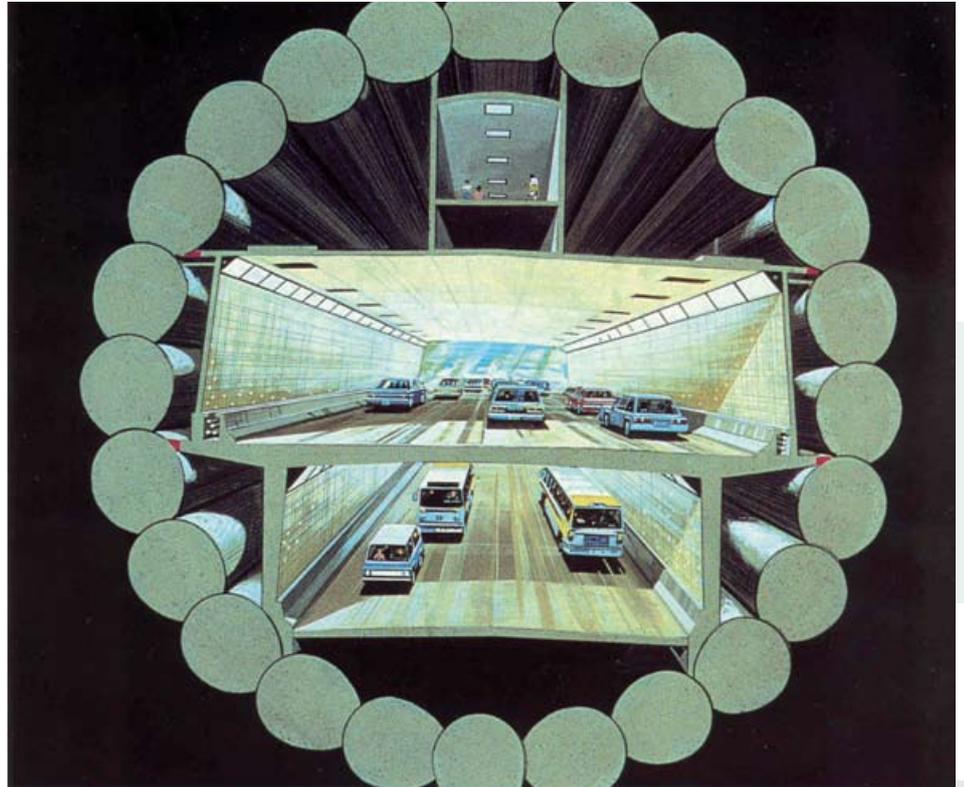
Mount Baker Ridge Road Tunnel, Seattle, USA
